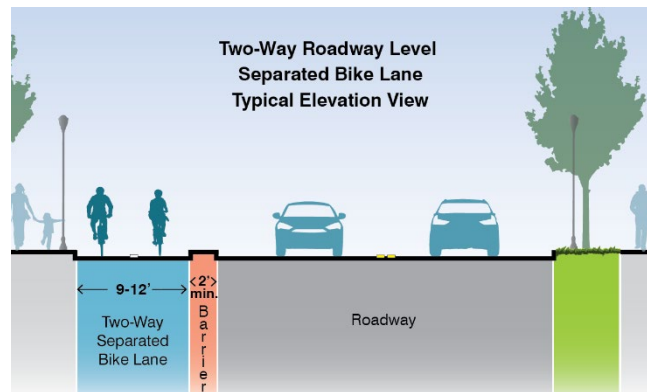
Two-Way Separated Bike Lane at Road Level
